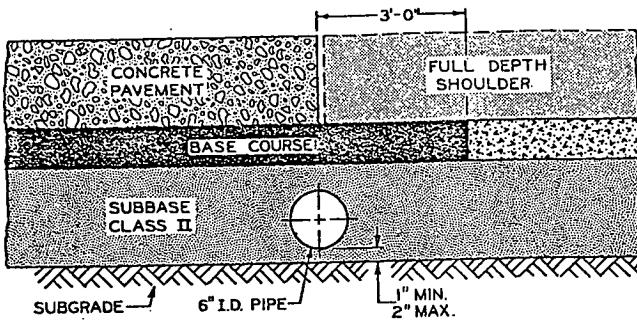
Cross section of subbase drain installation (Michigan) (55).
